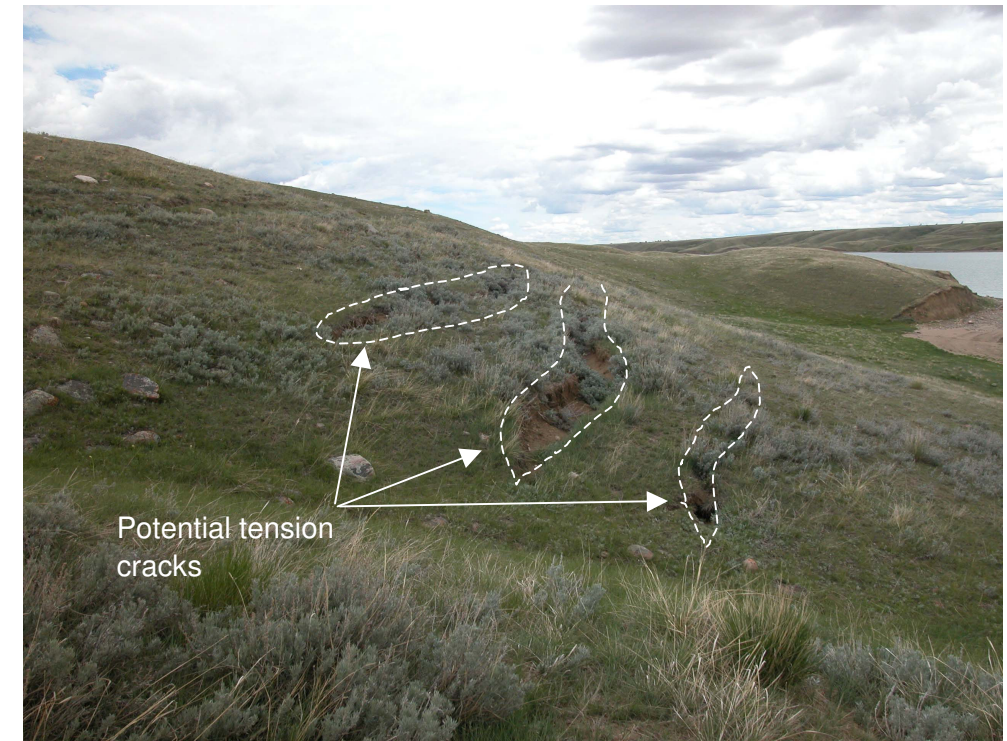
(right) – May 2004 – facing across the slope to some of the potential new tension cracks noted on the slope face downslope of the highway.
